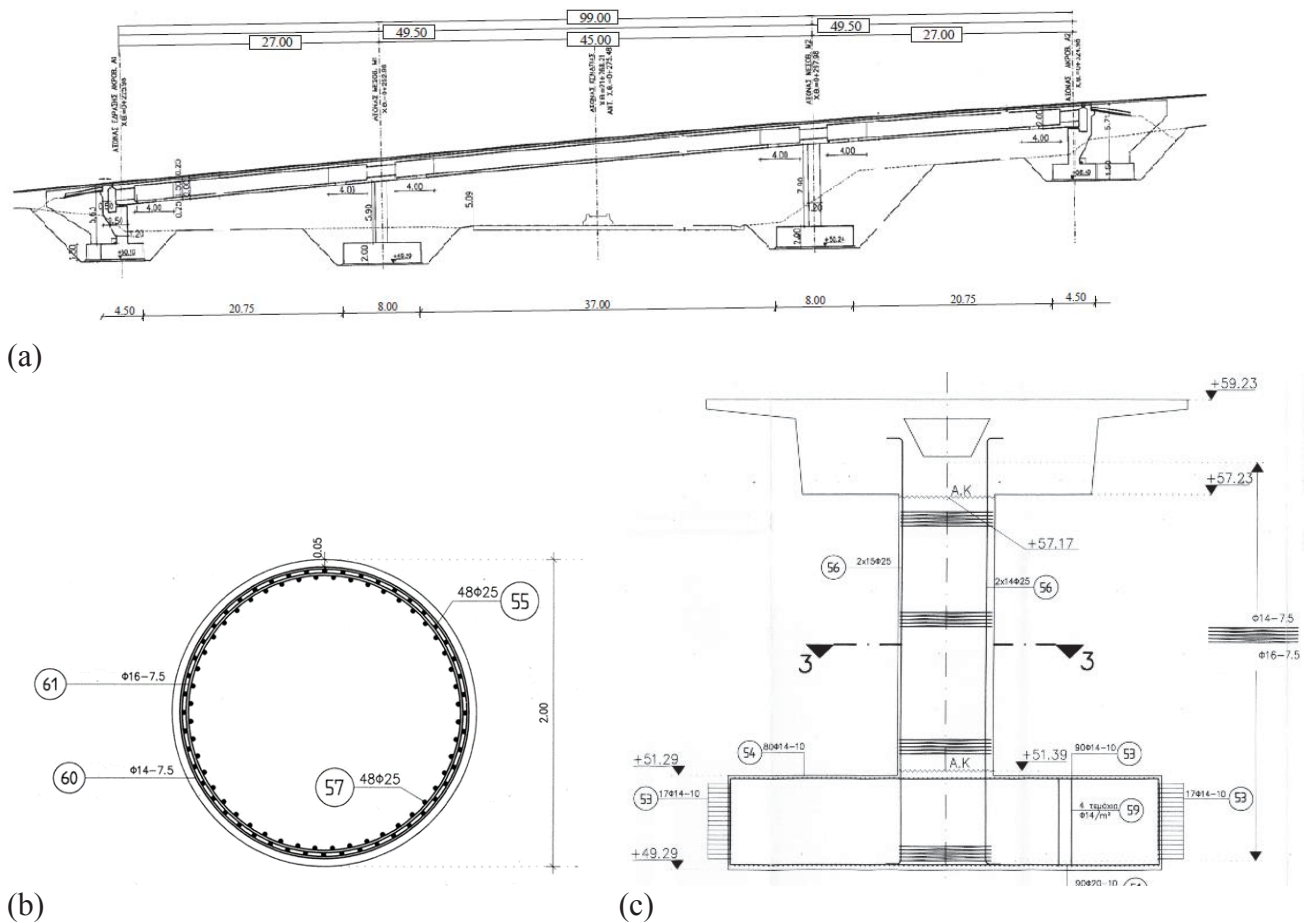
(a) Longitudinal section of the bridge, (b) Pier section, (c) Section close to pier
